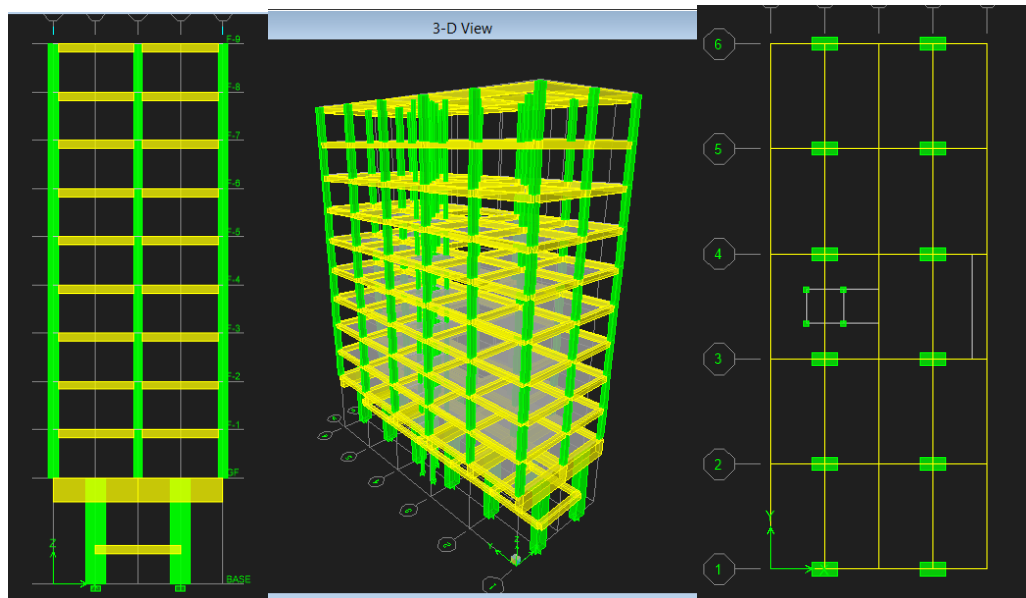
Elevation view, 3D view and ground floor plan view of case 1
